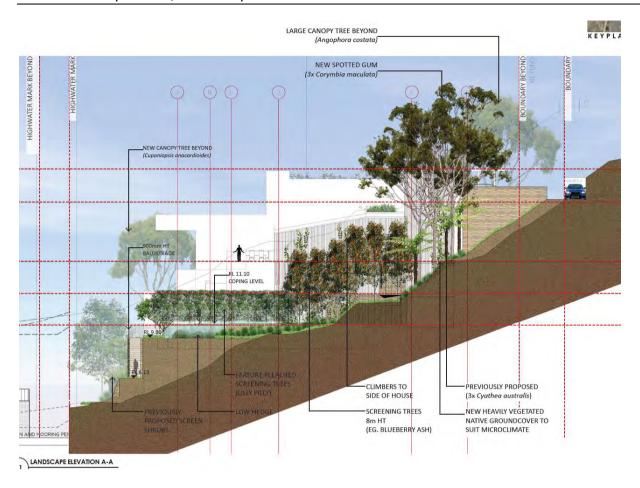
Extract from the Landscape Plan Elevation AA (western side of the dwelling)
